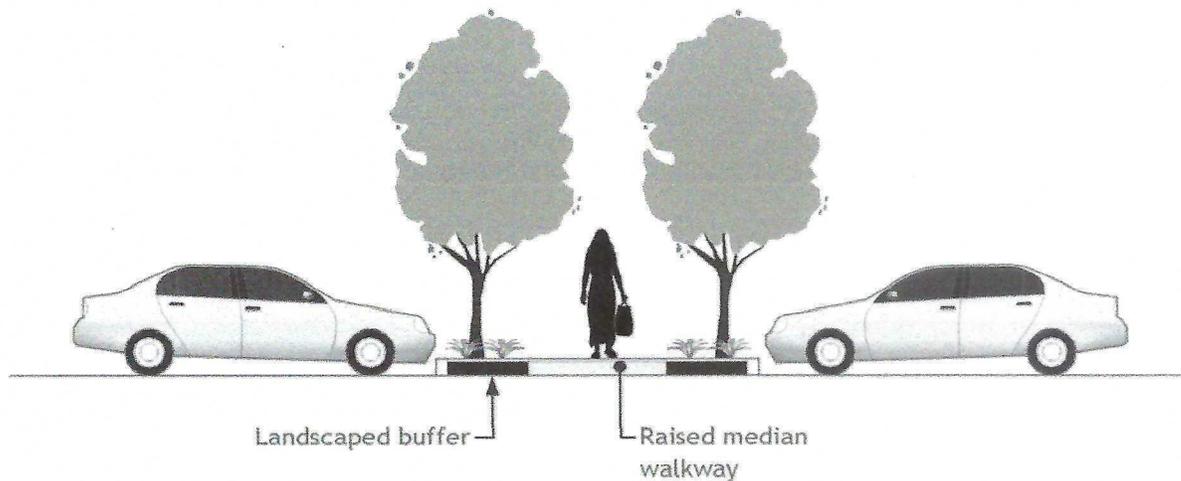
C: Pedestrian Walkways in Parking Lots
